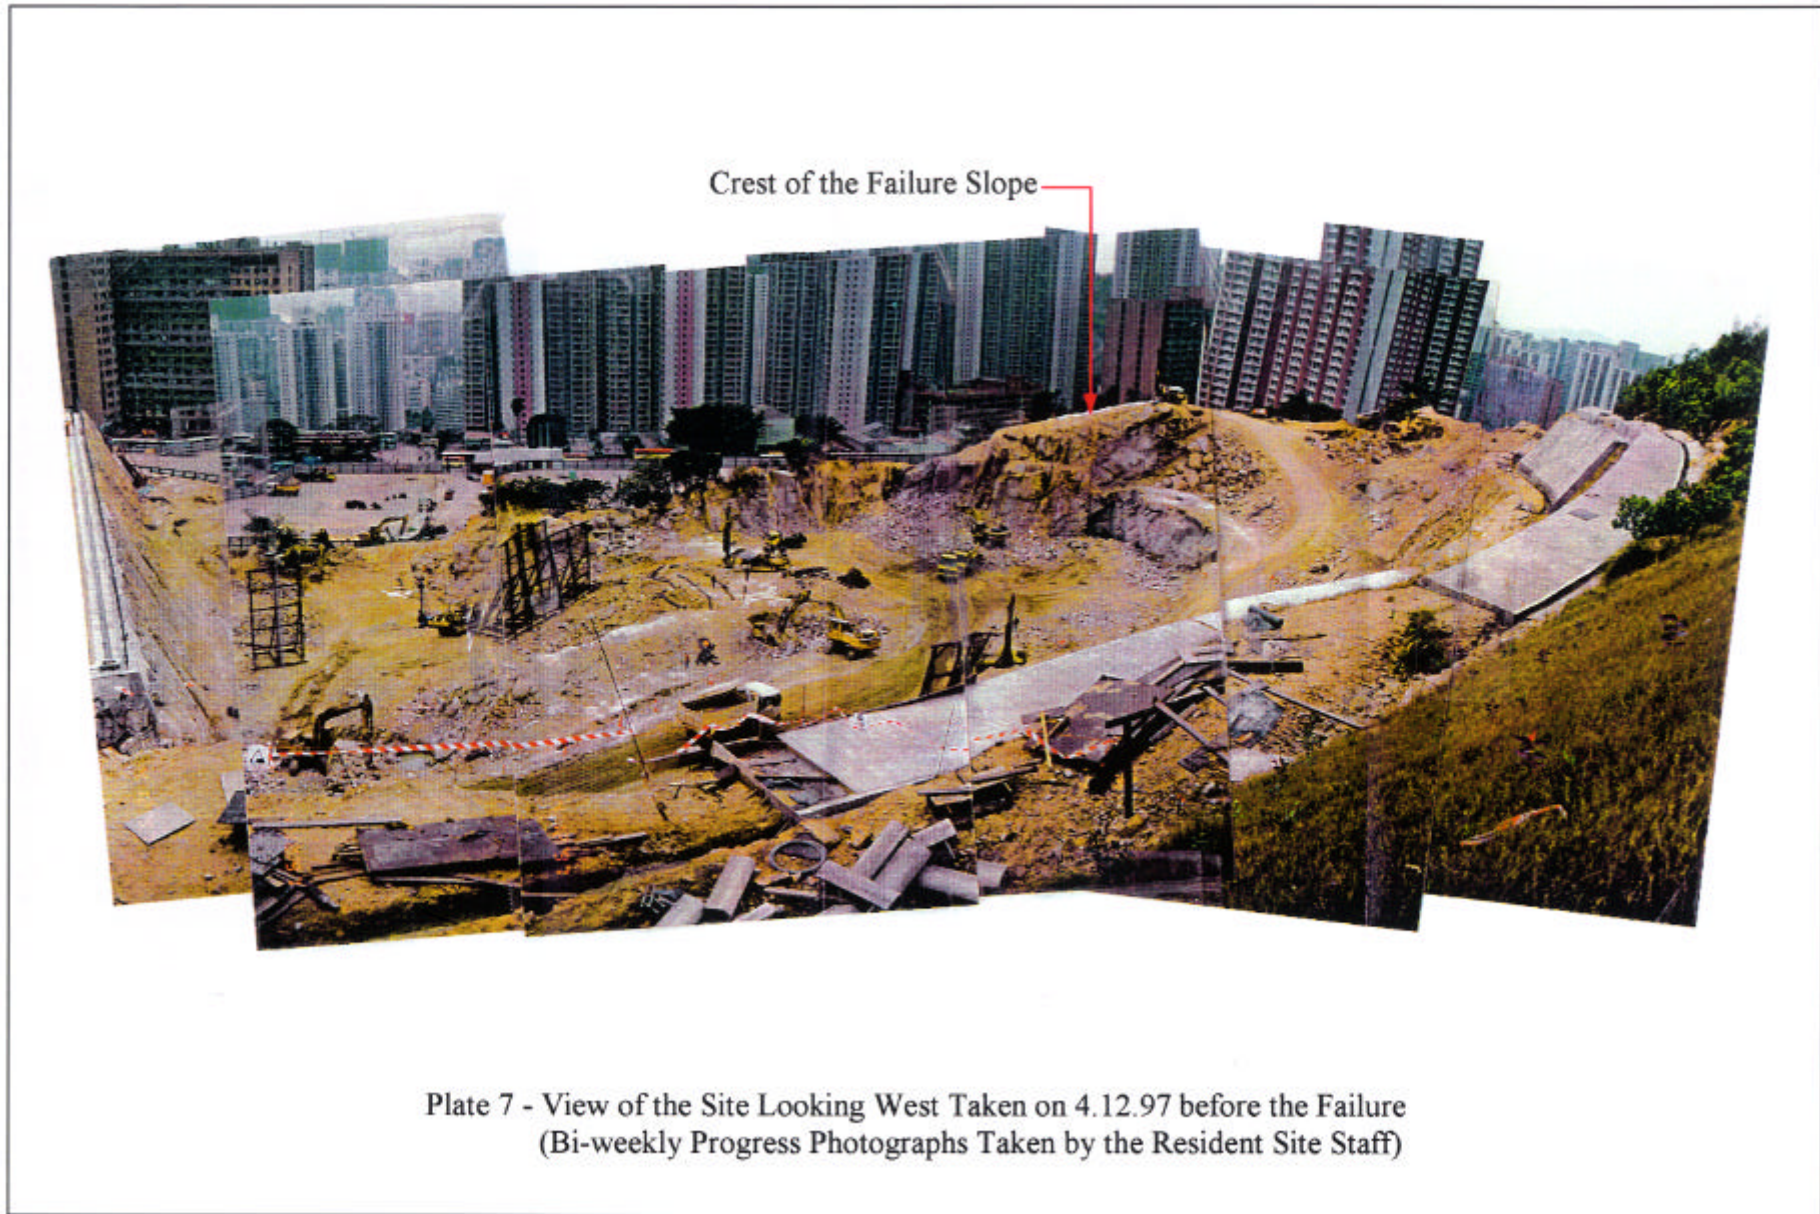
View of the Site Looking West Taken on 4.12.97 before the Failure
